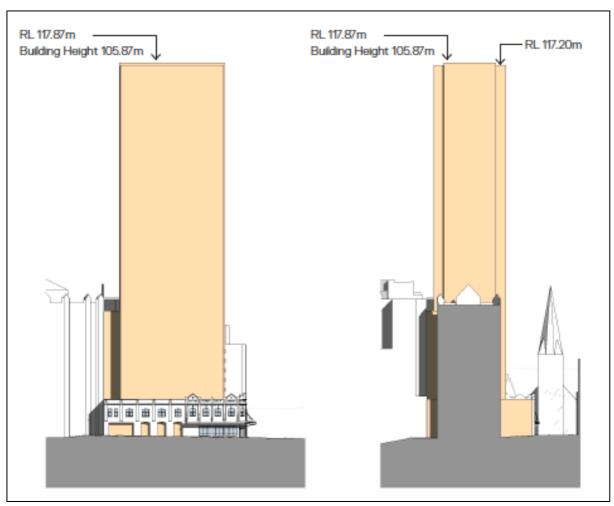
X South and West DCP Envelope Elevations (Source: Grimshaw October 2020)
